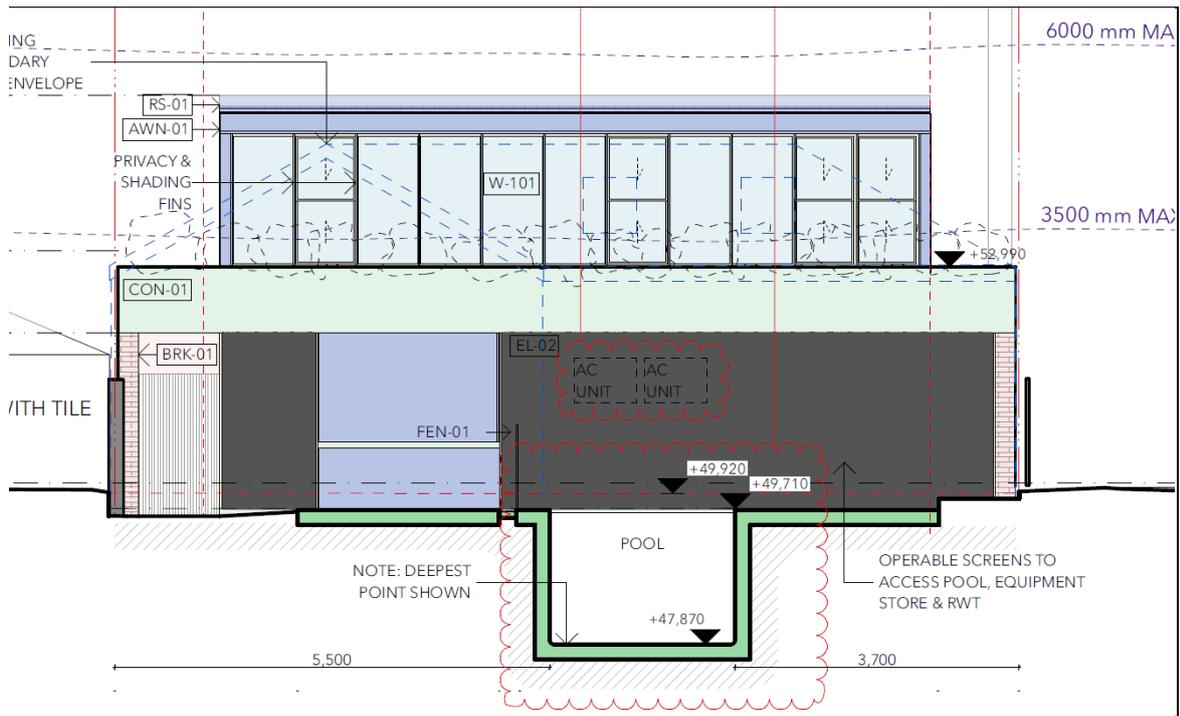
Approved Northwest Elevation (rear of the secondary dwelling/garage)
